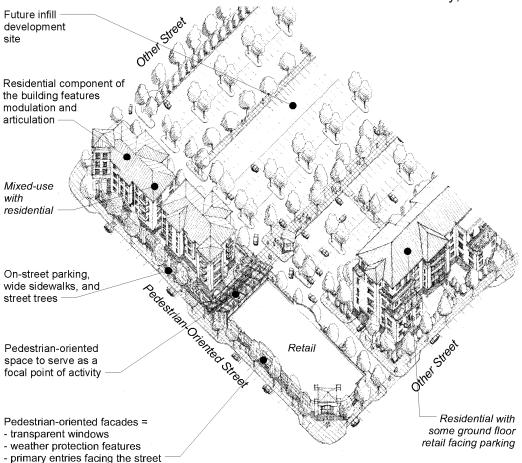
An example of desirable mixed-use site/building layout and orientation. Note how the buildings front on the pedestrian-oriented street.
